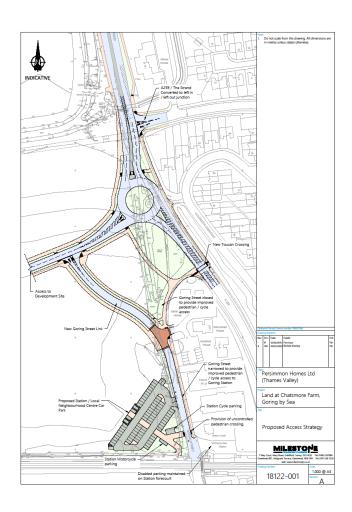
Site Access Arrangement, Land North West of Goring Station, Goring
